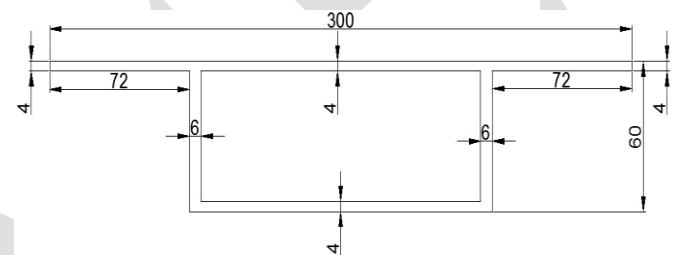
Cross Section of Simply Supported Box Girder Bridge
